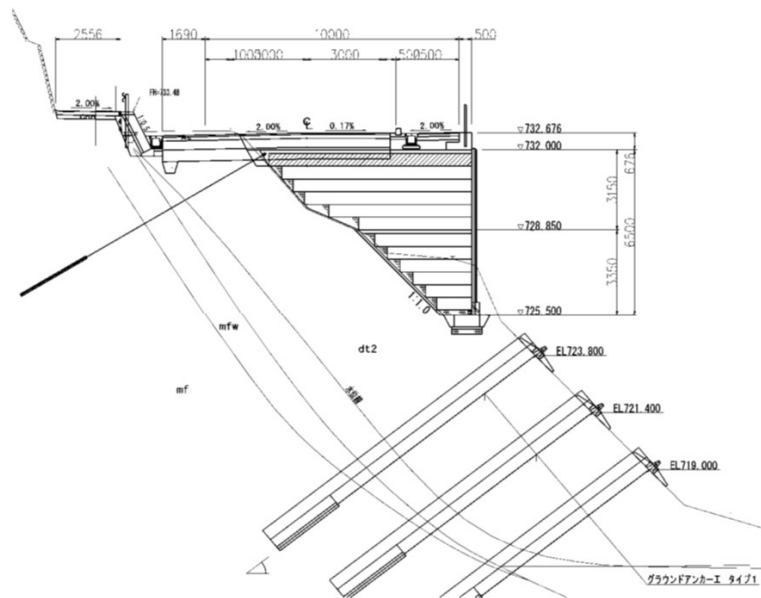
Design cross section of Otari Road in Nagano Prefecture, Japan (EDO)
